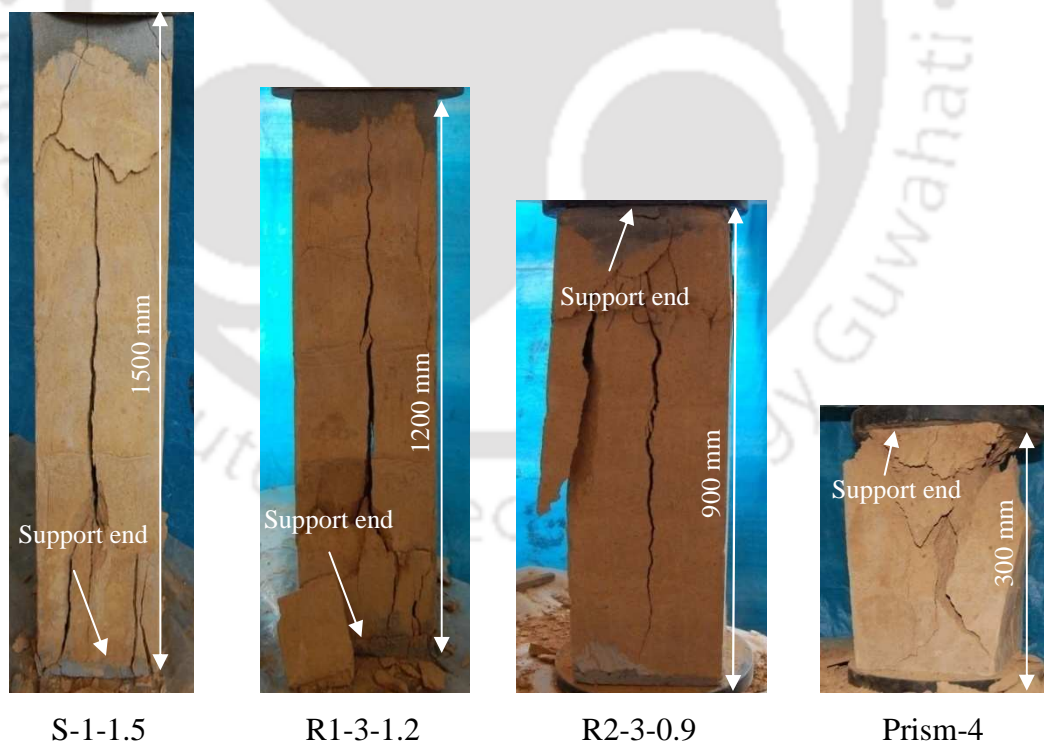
Failure pattern of test specimens (columns and prism).
